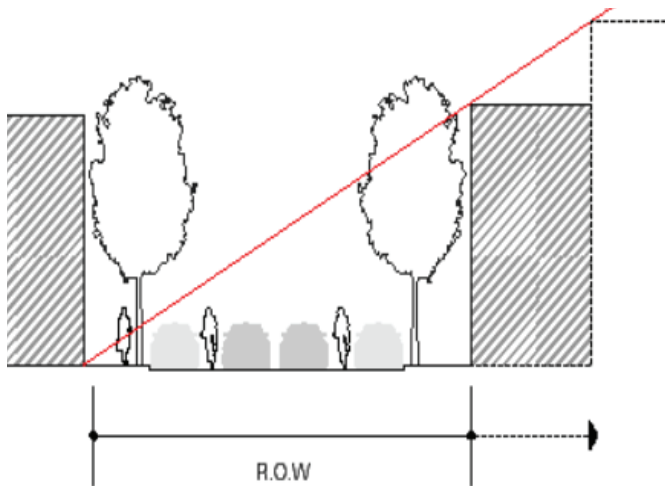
Diagram from the Mississauga Official Plan Figure 9-8 Demonstrating Appropriate Street Enclosure by Tall Buildings.
